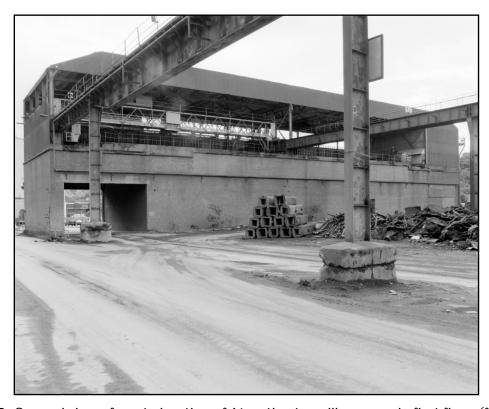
General view of west elevation of A1, noting travelling crane in first floor (film 12:3)
